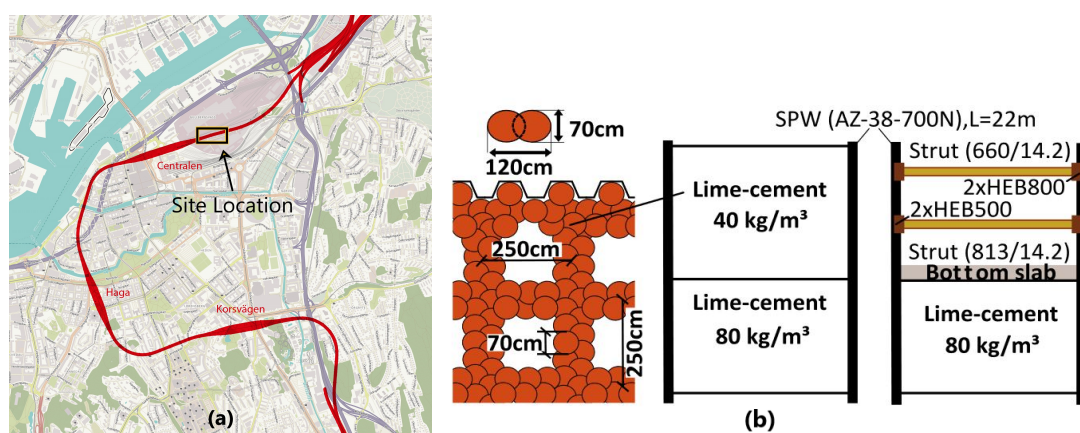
a) E02 Centralen site, Location: $57^{\circ}42'25''N, 11^{\circ}57'59''E$ (Website link), b) Cross-section of deep excavation of E02 site with column layout adapted from (Bozkurt et al., 2023)
